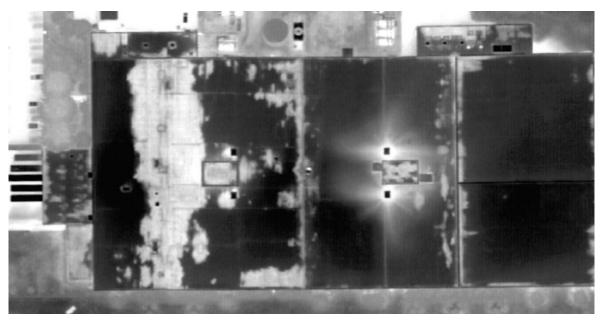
Aerial infrared image of moisture within insulation of conventional built-up roof. Note only one section of three requires replacement. The other two roof sections display minor roof leaks around curbs and flashings. (Courtesy of AITScan and Stockton Infrared, Greg Stockton)
